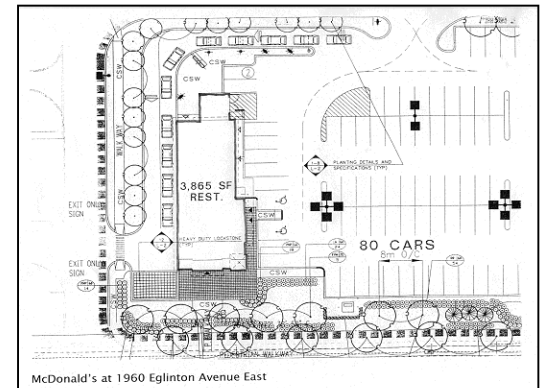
The site plan of the McDonald's restaurant on Eglinton Ave. It illustrates the positioning of the building, the outdoor patio along the streetline, the location of the stacking lane to the side, and the landscape plan.
